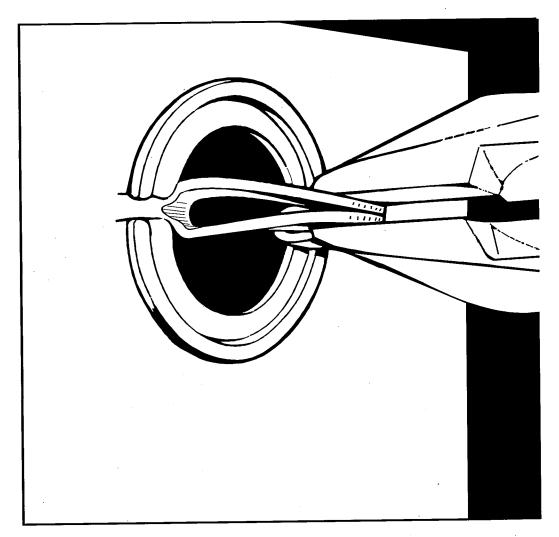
KNOCKOUT REMOVAL—STEP 3
